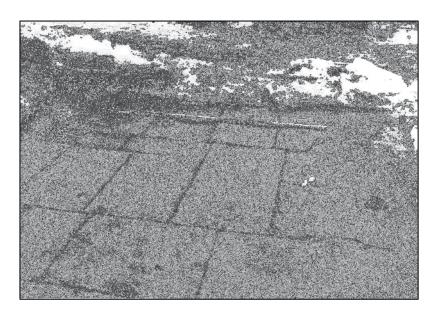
Building C, flagstone floor in S GF room, looking NE (photo 6/7).
